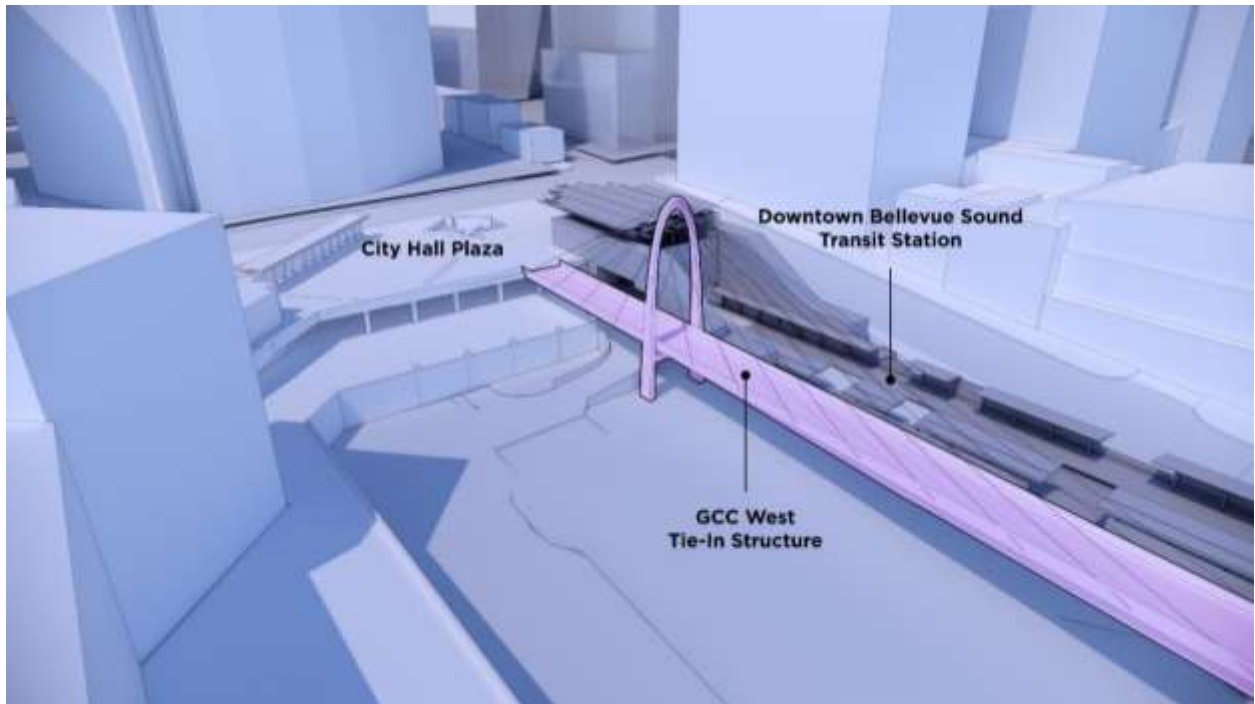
Conceptual rendering of west tie-in structure, Cable-Stayed Cantilever.
